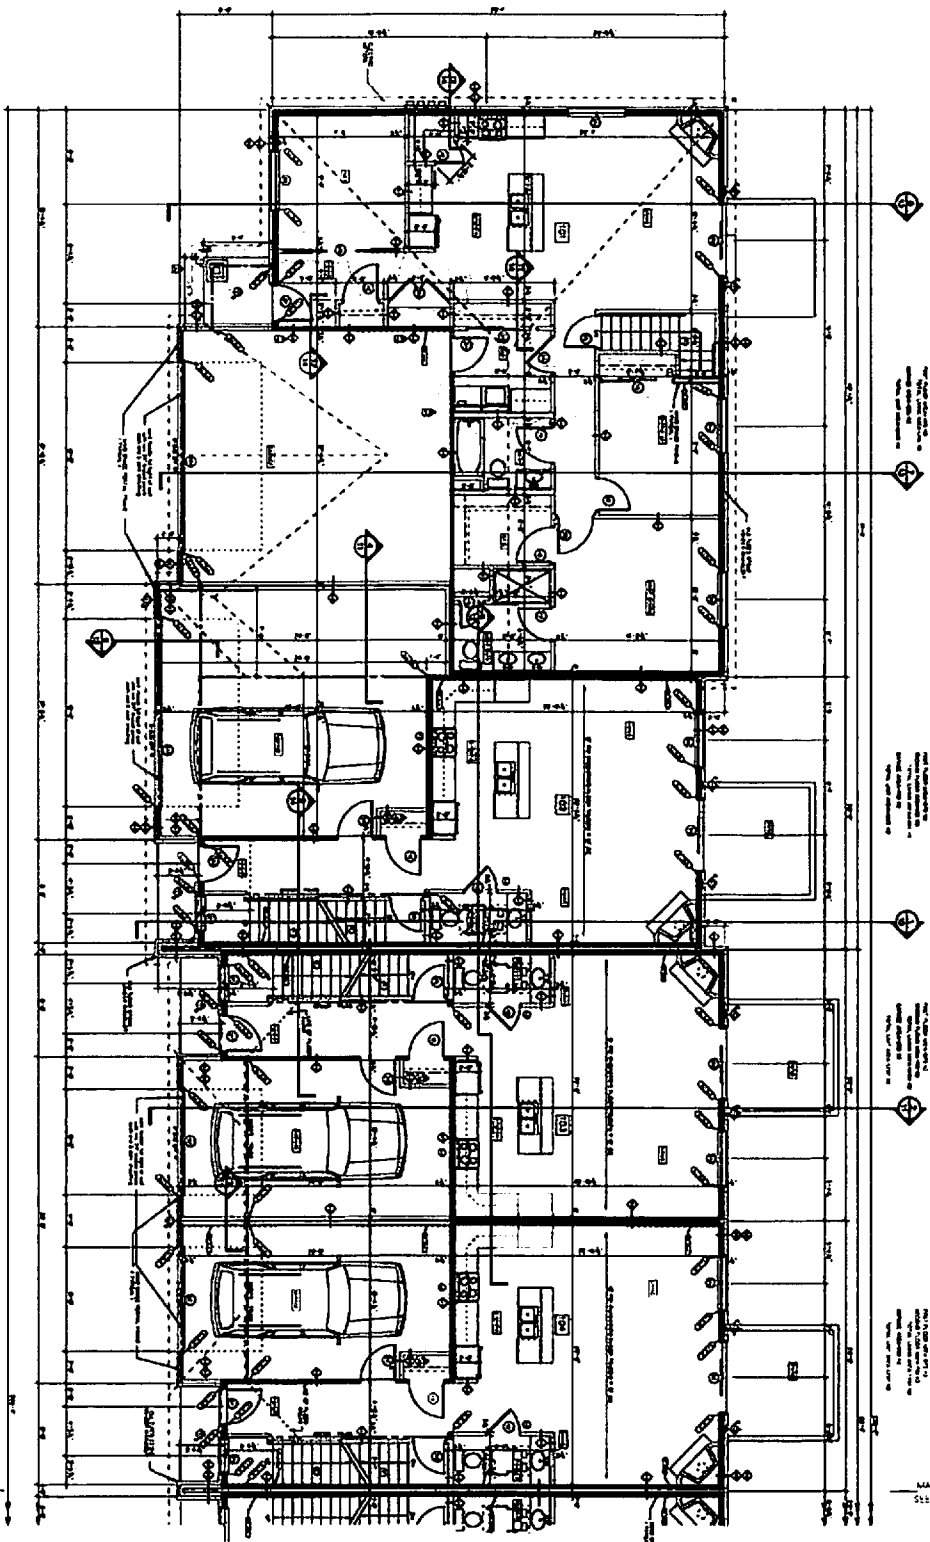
DETAIL FIRST FLOOR PLAN - RIGHT HALF
